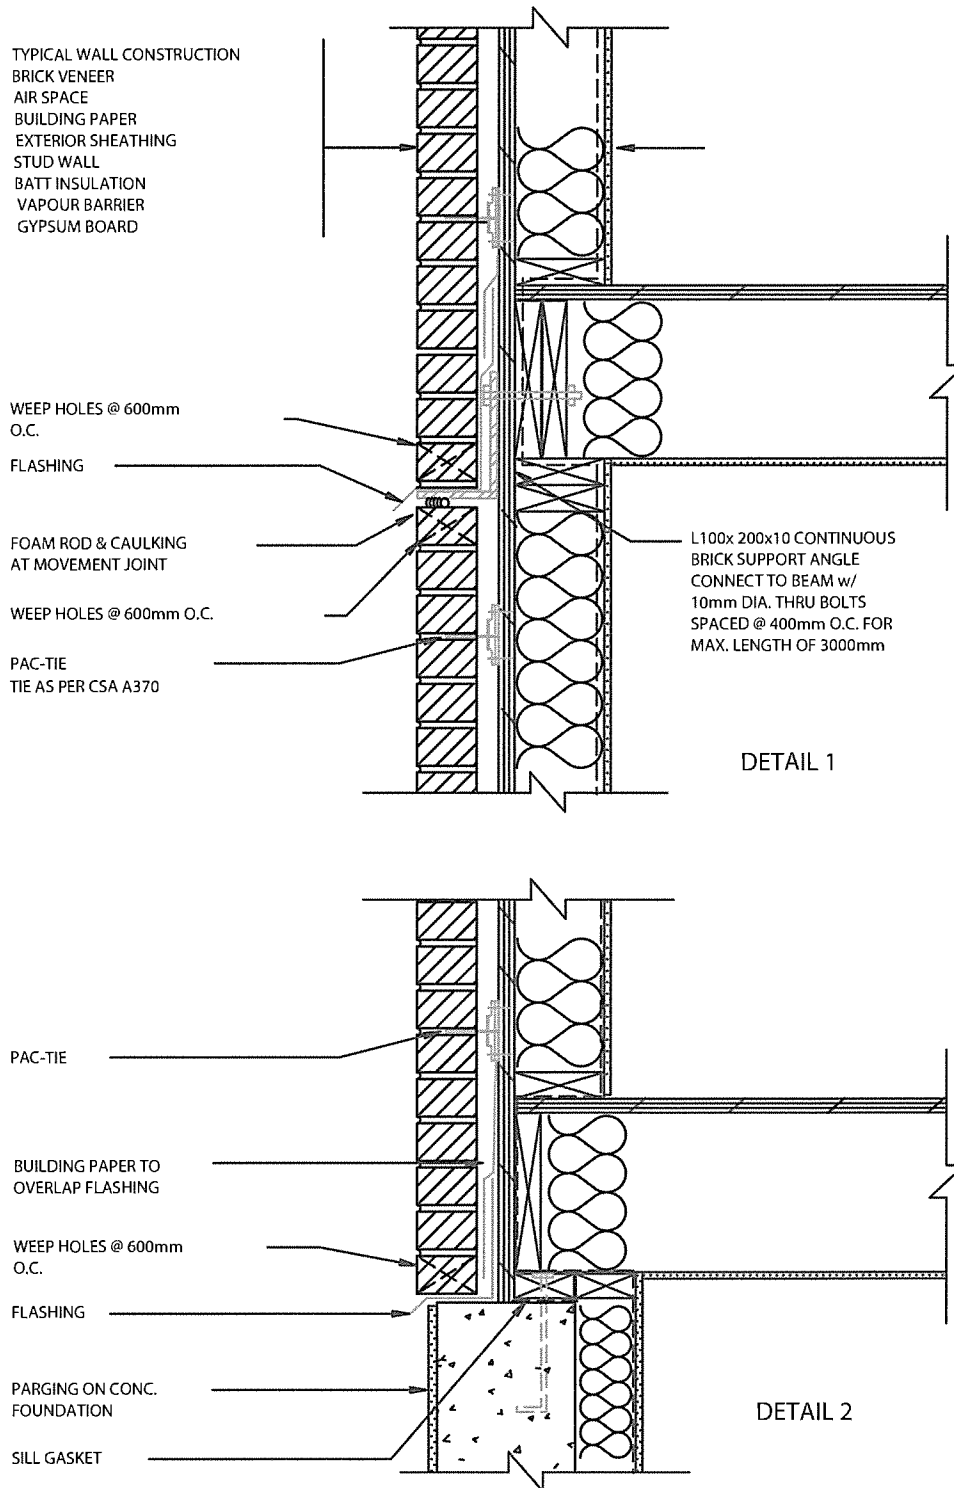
DETAILS OF BRICK VENEER AT GROUND AND FLOOR LEVELS (UNINSULATED CAVITY)
